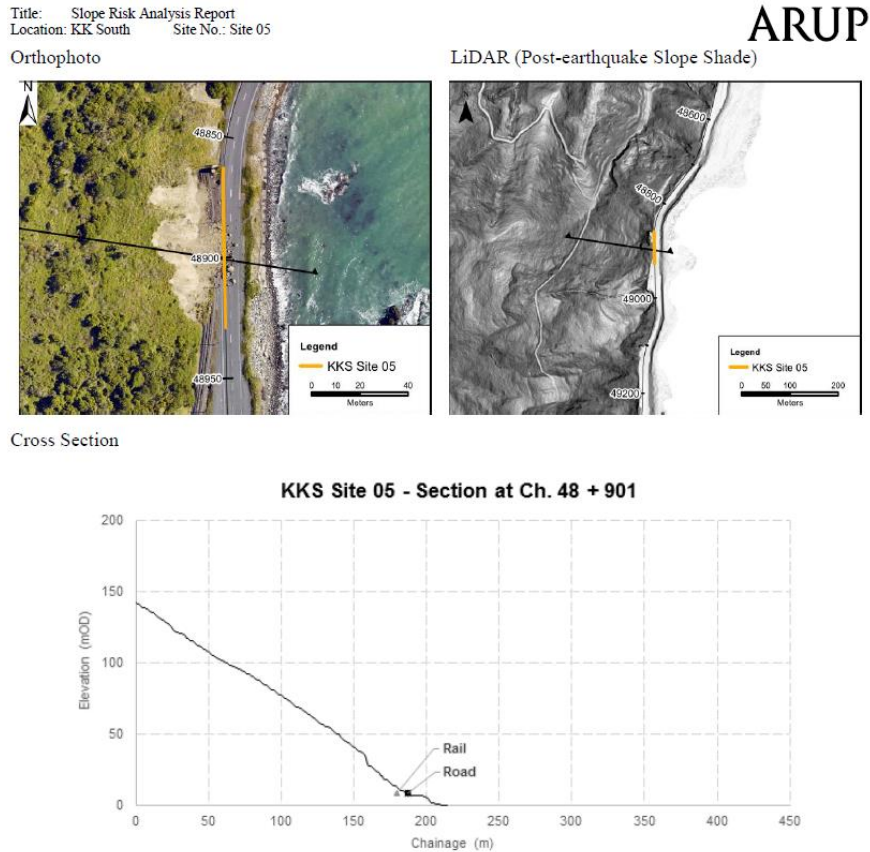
Example of automated plan, slope shade, and cross-section generation from GIS.
